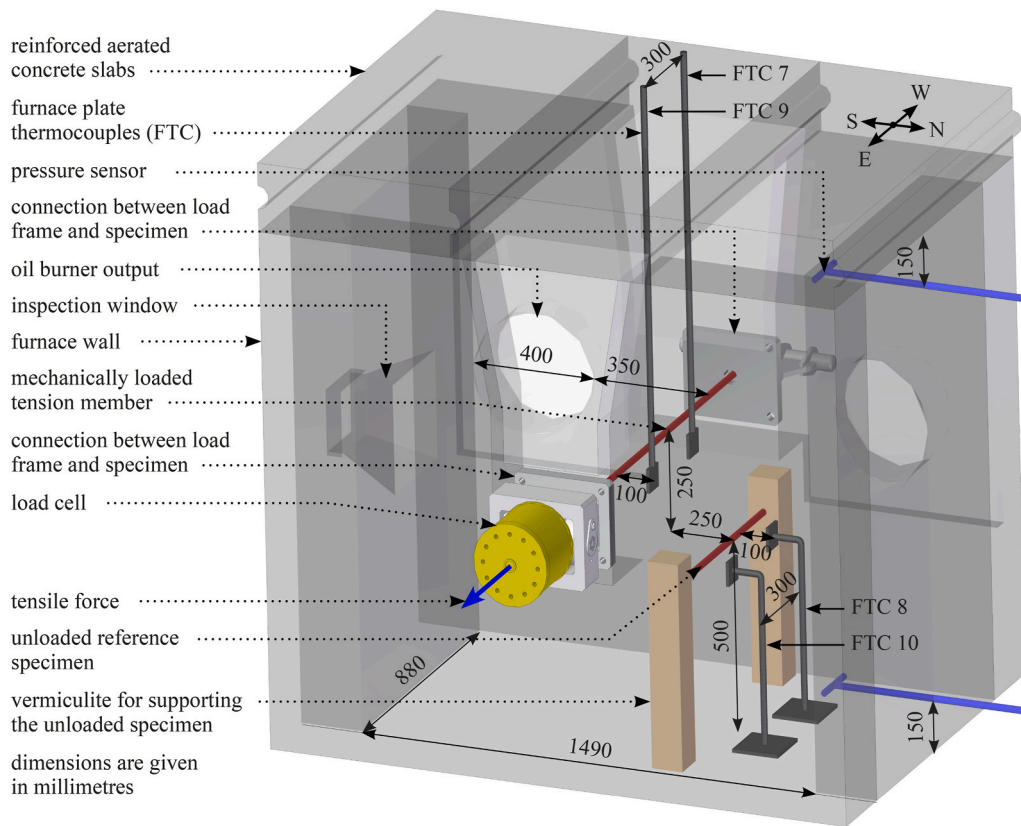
Test furnace showing the mechanically loaded and unloaded steel tension members.
